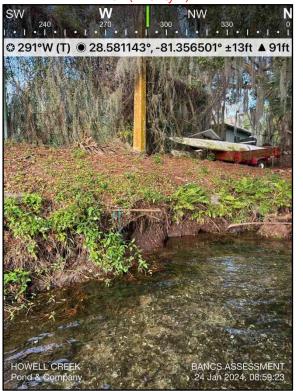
Structure 26; Wooden Retaining Wall (Priority 4)
